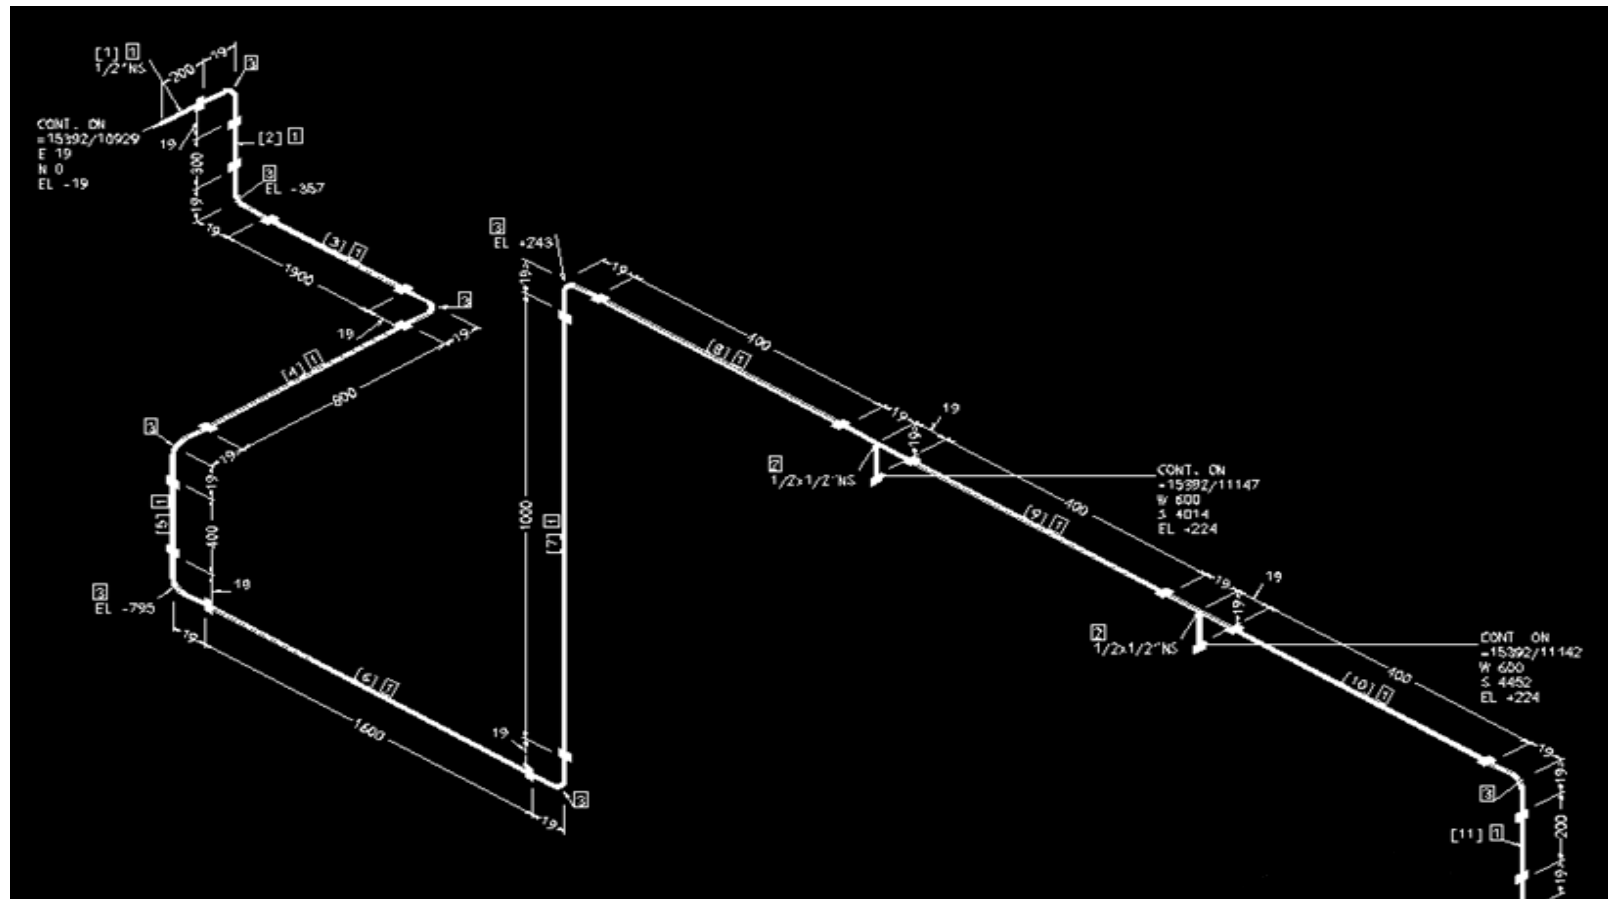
Tubing layout at PERKASA Building (Isometric review)
